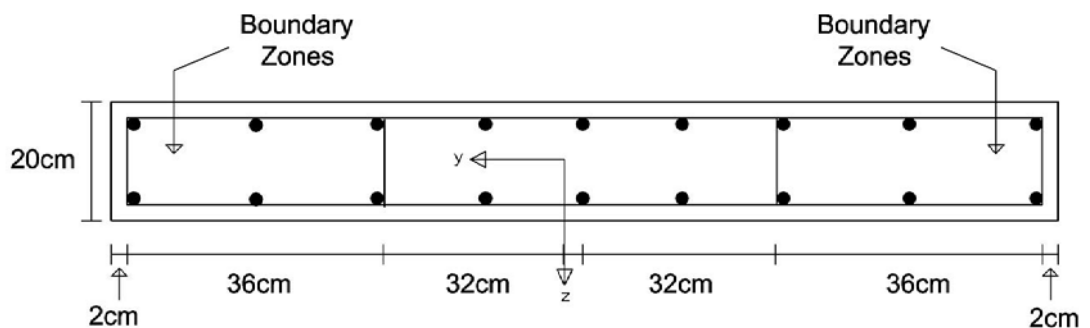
Cross-Sectional and Reinforcement Details of the First Storey Wall
